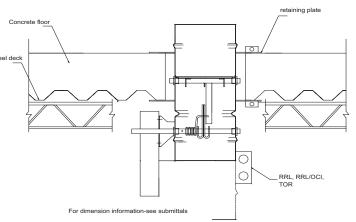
Damper installed in concrete floor with steel deck with actuator below the floor.
